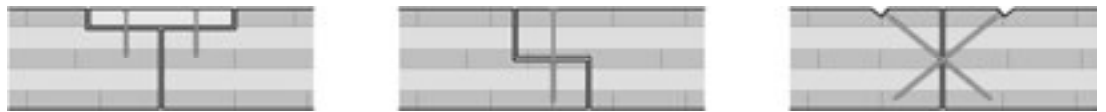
Frequently executed joint designs (a) butt joint with milled-in cover strips, b) rebated joint, c) butt joint with fully threaded screws)
